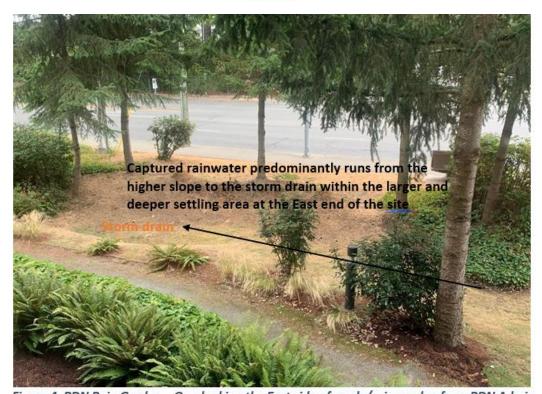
RDN Rain Garden — Overlooking the East side of swale/rain garden from RDN Admin Building
